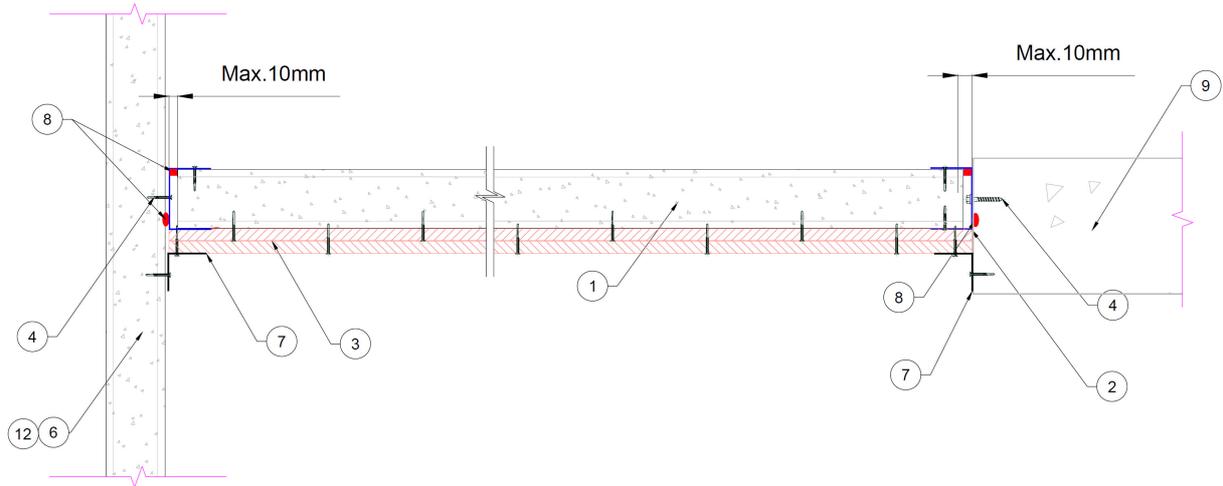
Speedpanel ceiling protected with plasterboard linings (Longitudinal Section View)
